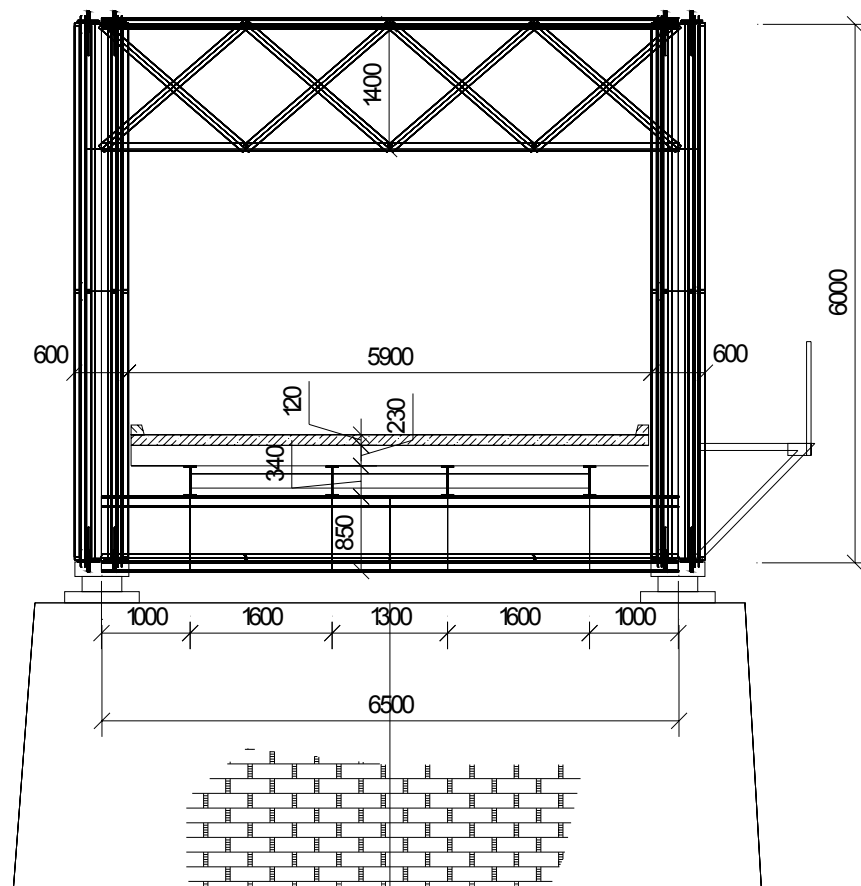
Cross section of the Old Bridge over the Danube in Bratislava
